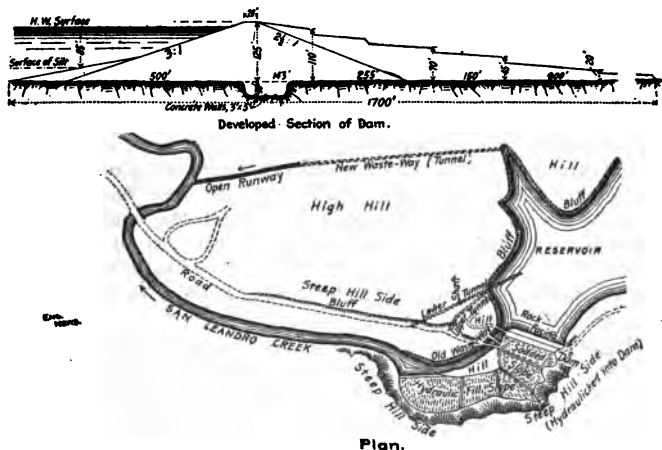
Plan and Cross Section of the San Leandro Earth Dam.
